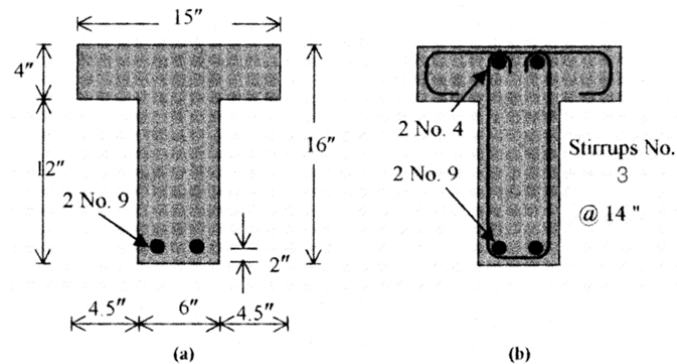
Cross section of beams: (a) beams without stirrups, and (b) beams with stirrups (dimensions in inches) (De Lorenzis and Nanni 2001)
